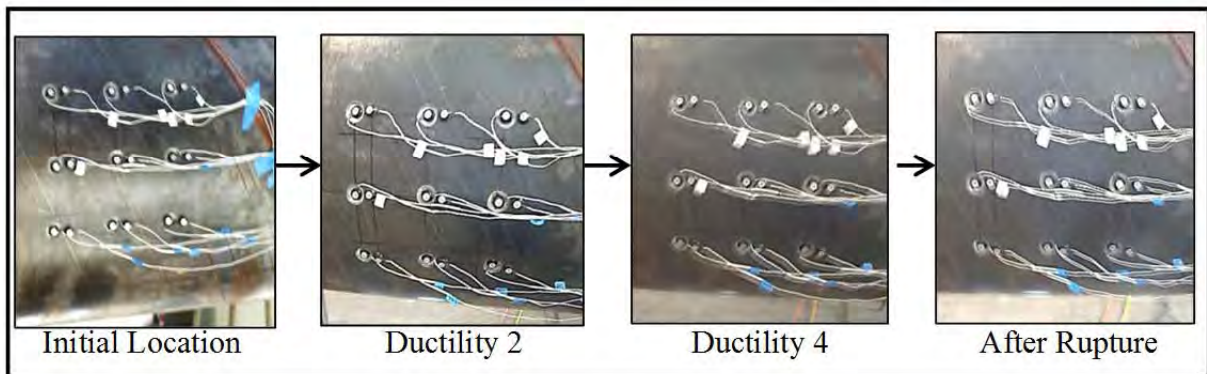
Photographs of LED targets measuring slip throughout the test
